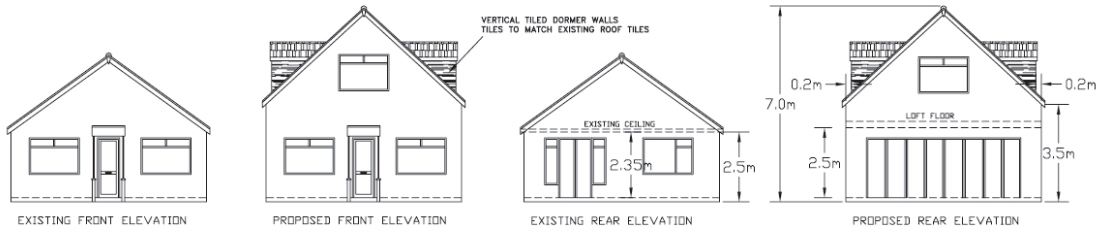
Proposed Plans (please note – larger version of plan can be found in the Committee Plan Pack)
